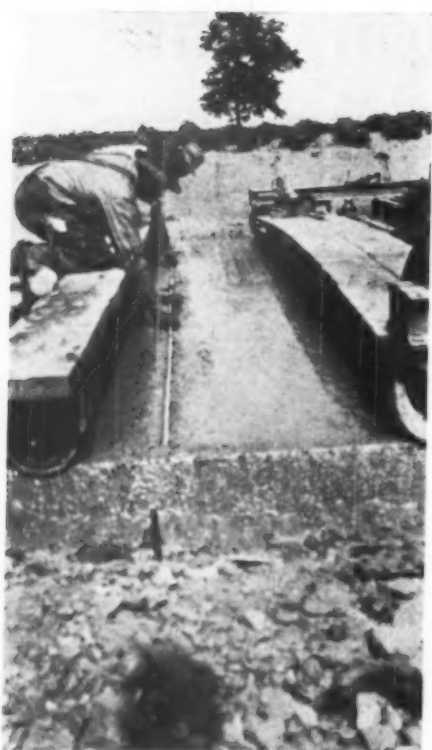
Inserting Metal Strip in Groove Cut by Apparatus
